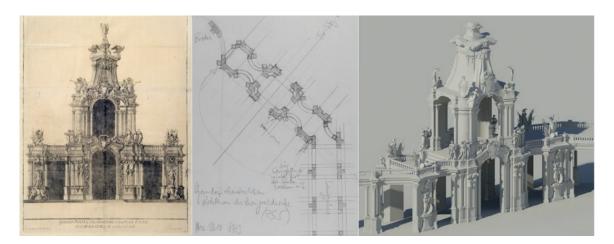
From elevation (copperplate from 1729) via a sketched reconstruction of the ground plan (2010) to the virtual model (2010-11), exemplified by a gateway tower of time-cut no. 5 (cf. above fig. 9).
